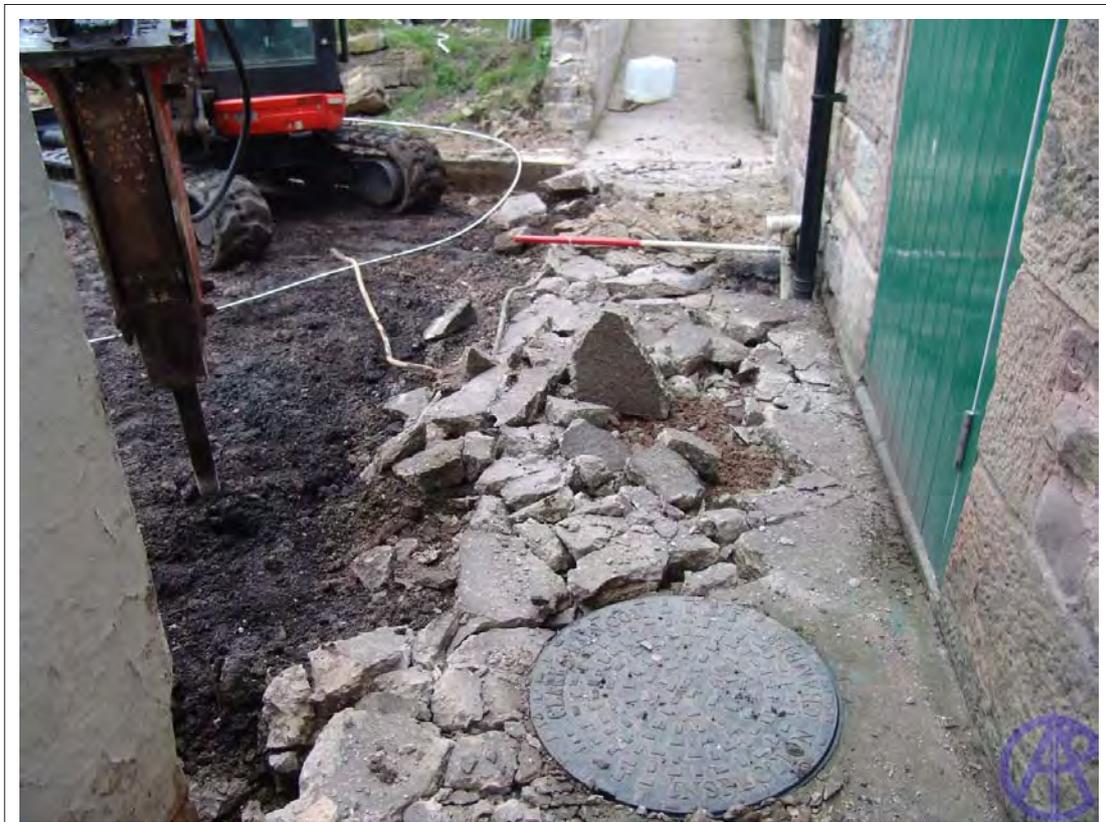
View north east adjacent to Anchor Inn kitchen during slab removal
